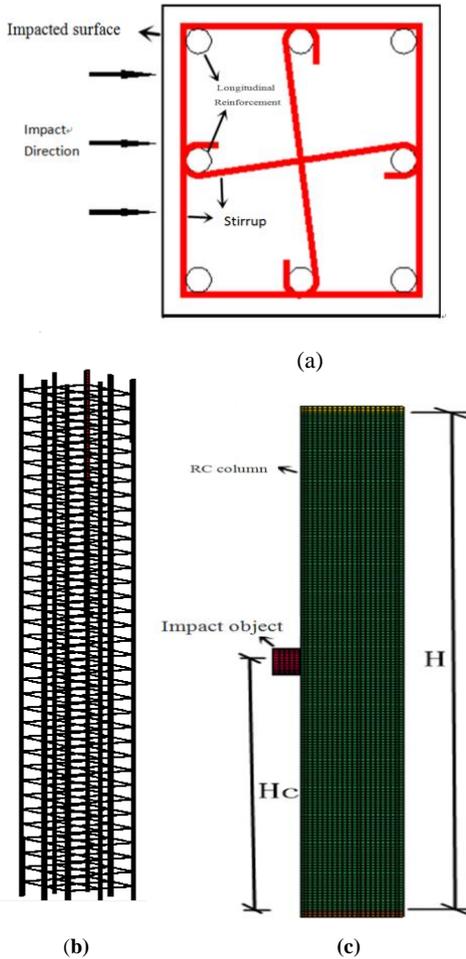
Schematic diagram of section size and finite element model of RC columns: (a) Section size; (b) Reinforced model; (c) Impact model.
